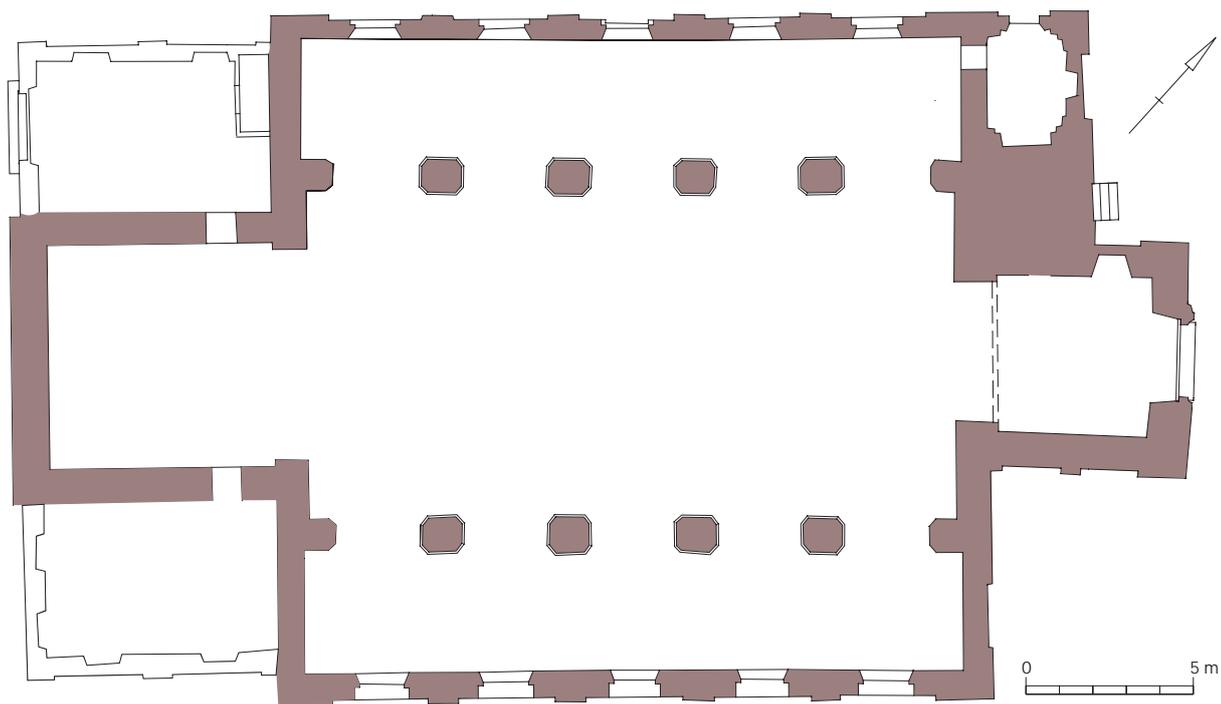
Ename, St. Lawrence's Church. Ground plan of the basilical building with an east and a west choir.
